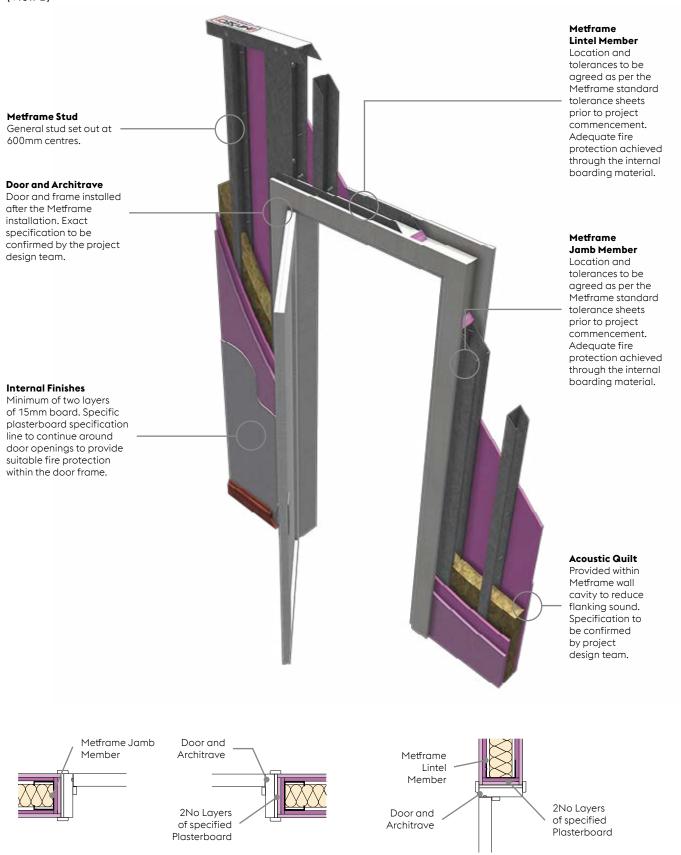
DOOR DETAIL IN AN INTERNAL PANEL
